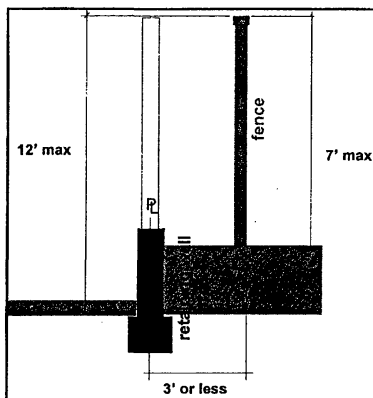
Fence Within Three Feet of Retaining Wall (Adjacent Owner Permission Required)
